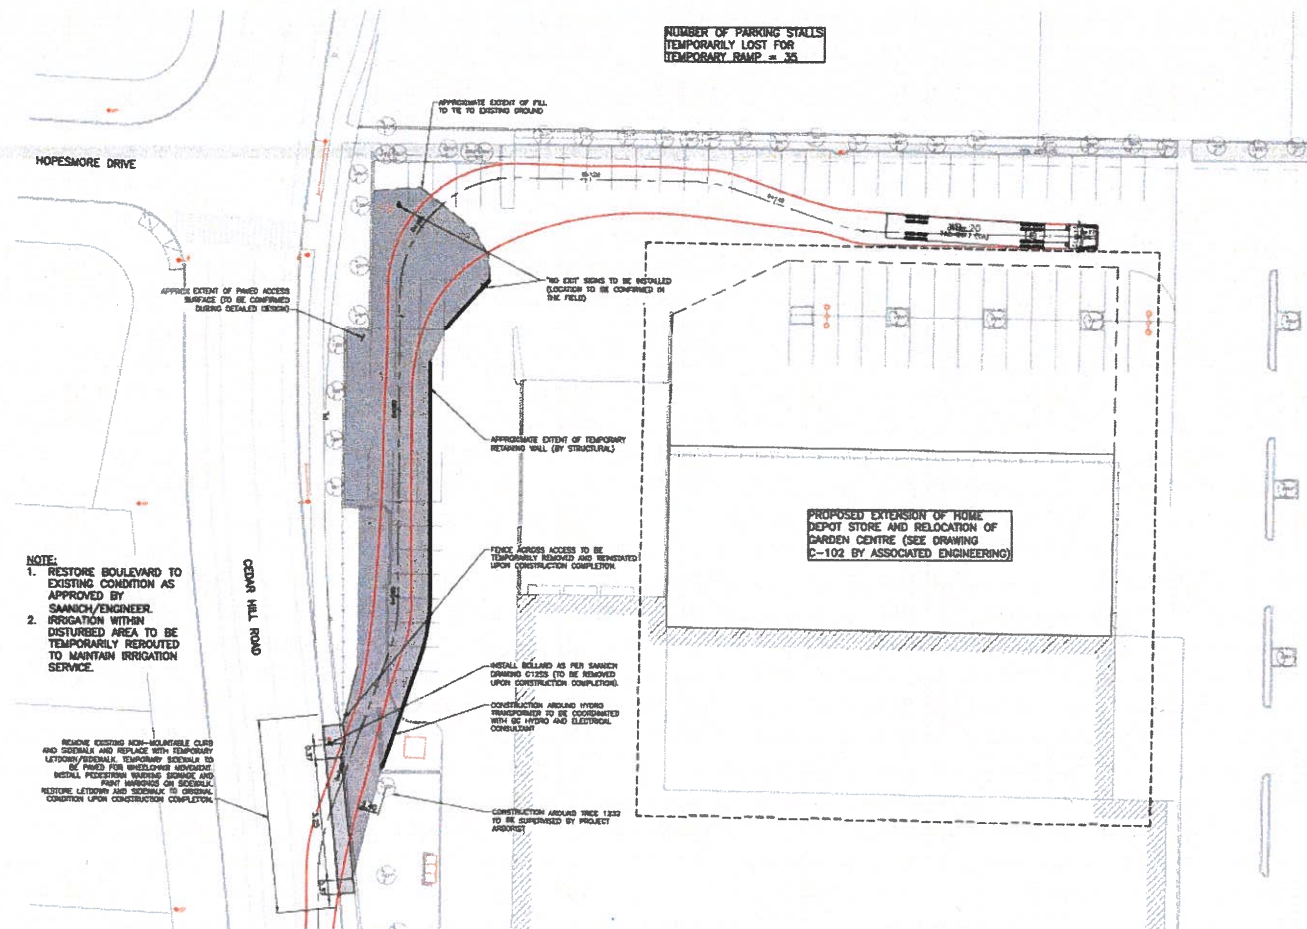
Proposed Temporary Loading Ramp (provided by WA architecture)
